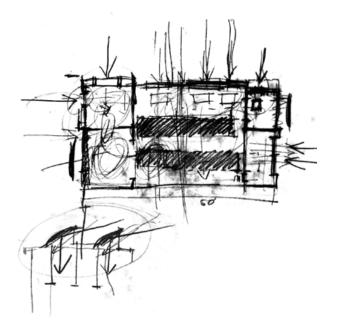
Samuel's floor plan showing north lighting (arrows on top), tables of work space (rectangles), lighting ceiling plan (hatched long rectangles) and a sectional drawing illustrating how lights come in and be reflected and controlled by the skylight windows and roof.
